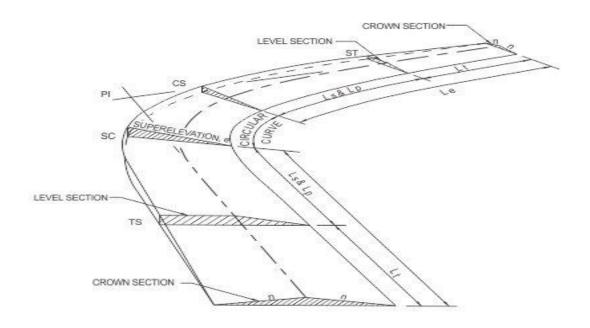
drawing of super elevation [Source: civil jungle (https://civiljungle.com/superelevation/)]
